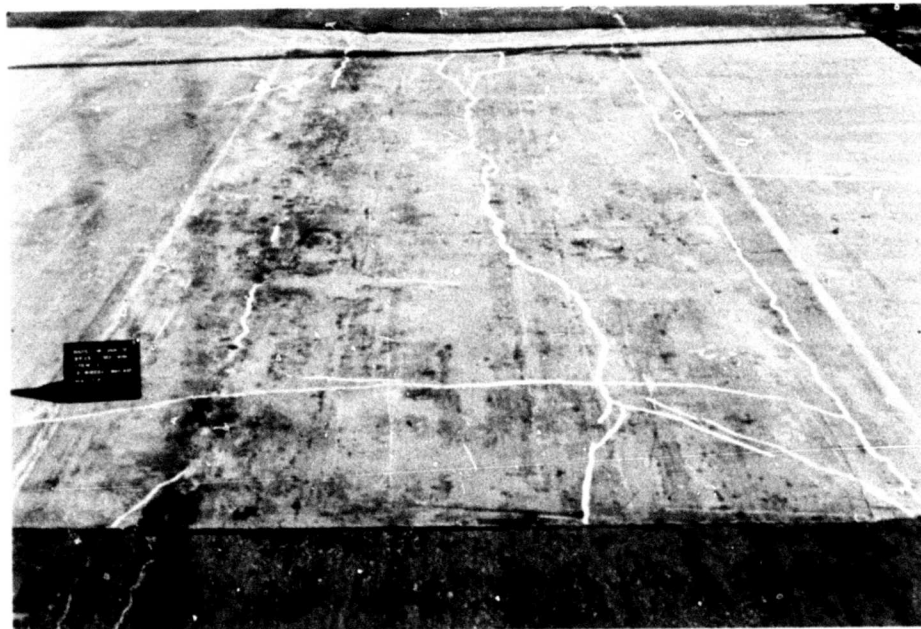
Condition of a 4-in. Thick Fibrous Concrete Overlay After 6900 Traffic Loadings. See above note
